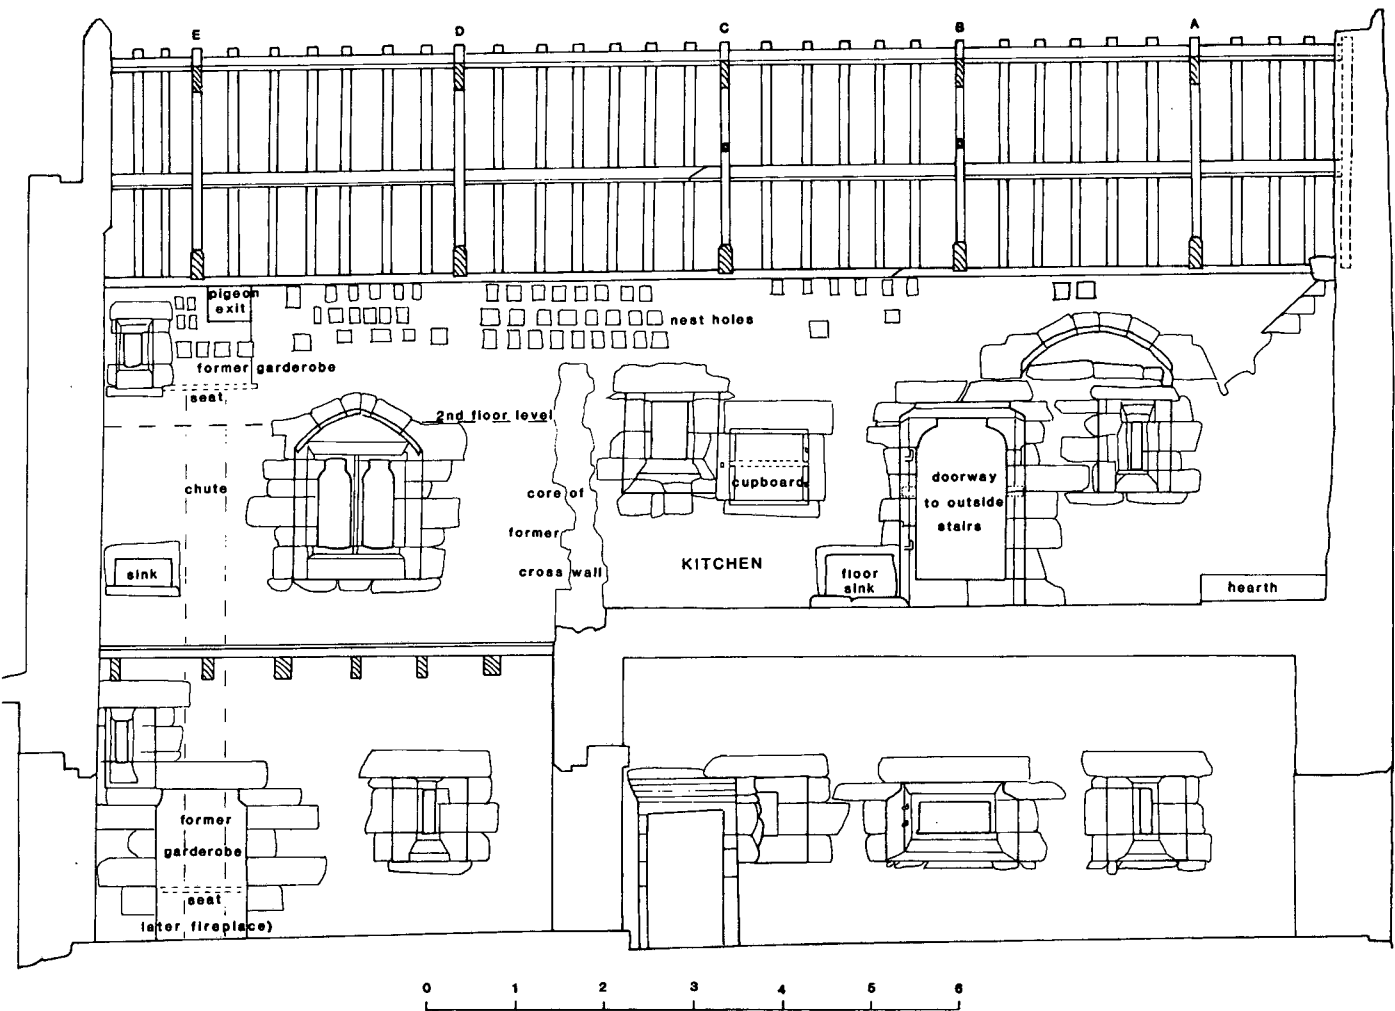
Existing internal elevation of west wall of kitchen range and roof frame as originally built.
